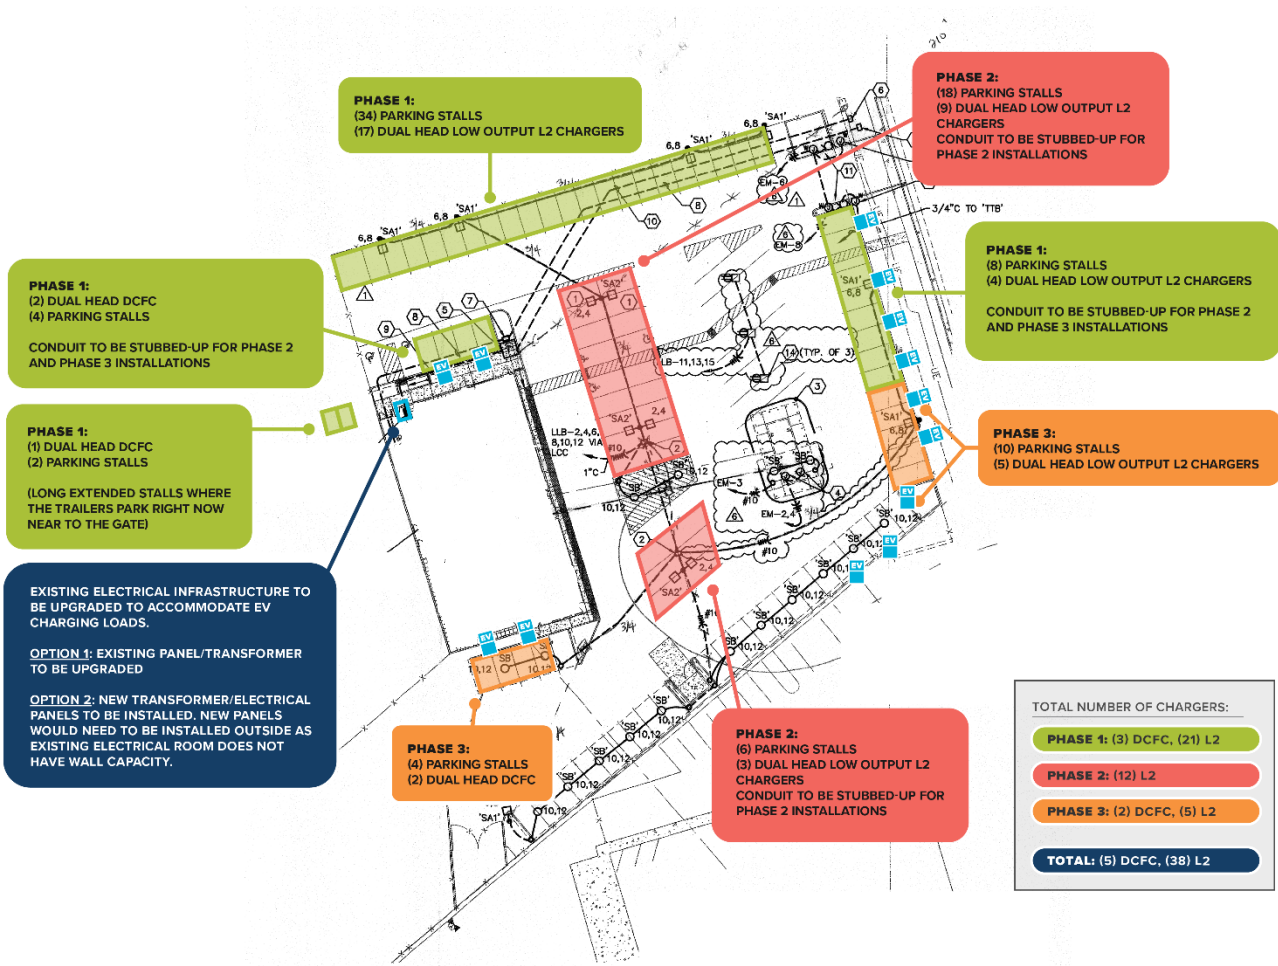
CONCEPTUAL CHARGER LAYOUT OF FLEET FACILITY ON IRON ROCK WAY
